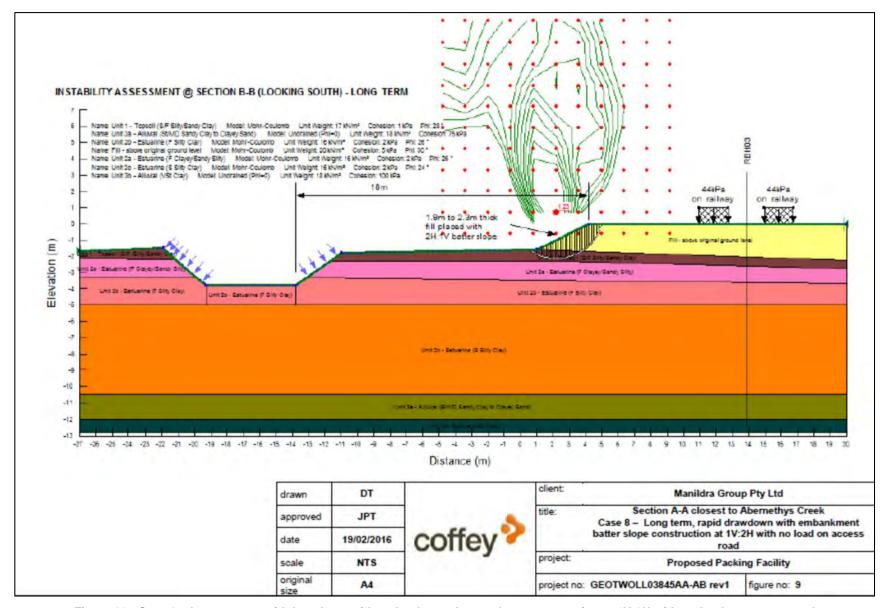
Case 8 – Long term, rapid drawdown with embankment batter slope construction at 1V:2H with no load on access road (extract Figure 9 – Coffey's Geotechnical Assessment)
